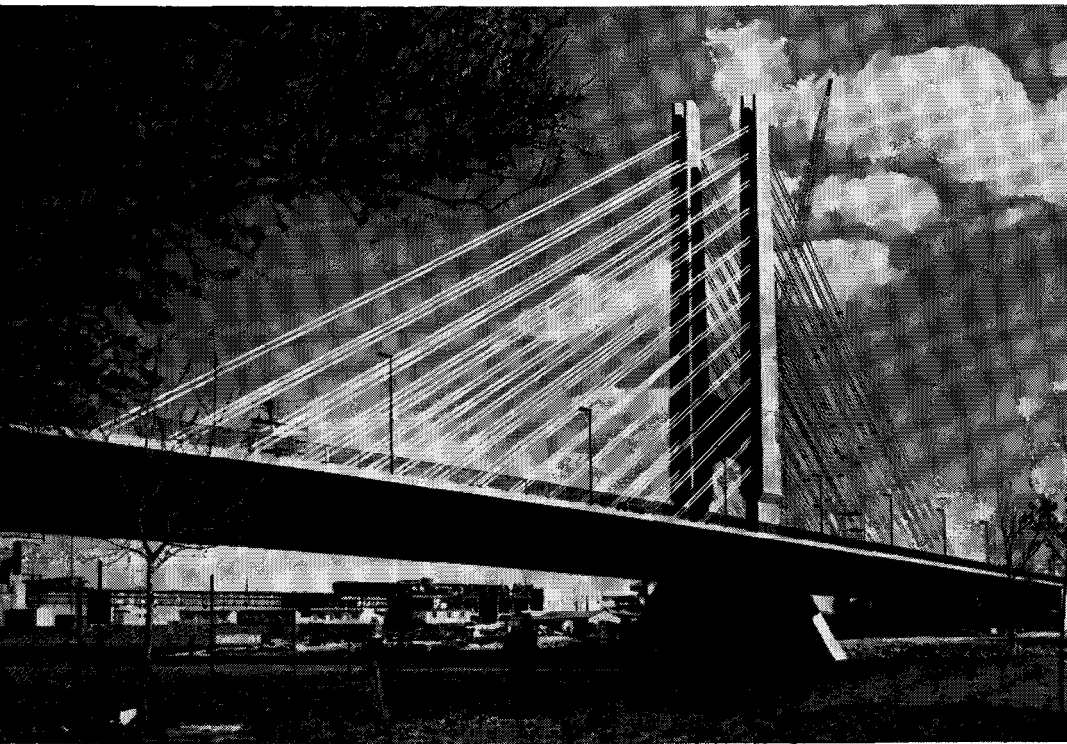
Multiple stay cables for Mainbrücke Höchst.
